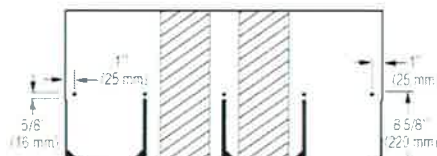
Use five nails for every full Grand Manor Shingle, Carriage House Shingle, or Centennial Slate.
